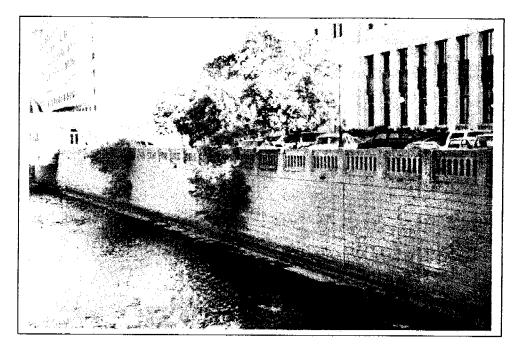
Section L. south bank between Sierra Street and Virginia Street, camera facing southeast, 2/7/02.
